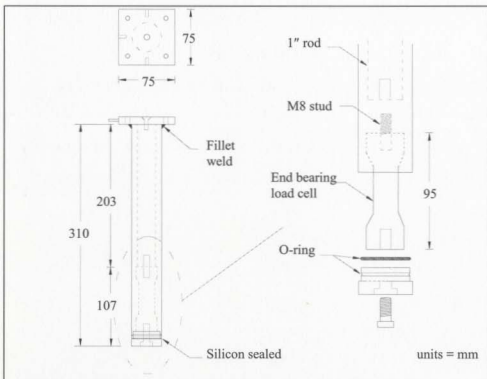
Typical design layout of pile models, Pile 3 shown.
